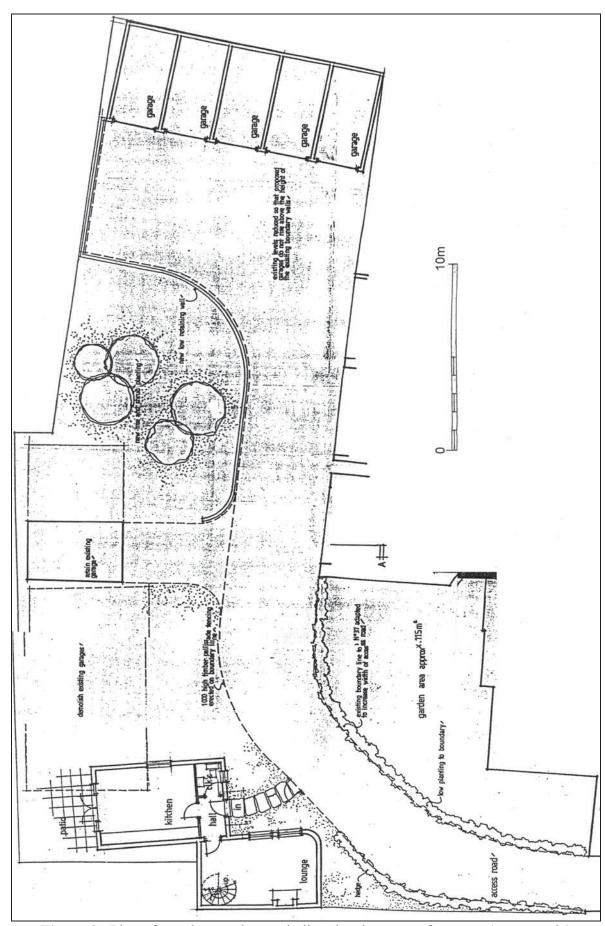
Plan of new house plan excluding development of garages (not to scale)
